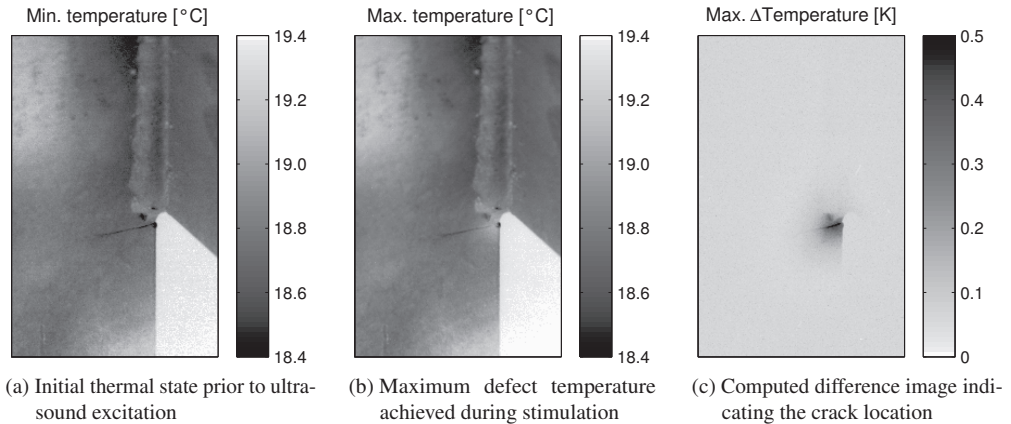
Vibrothermographic crack detection on a zinc-coated steel girder.
